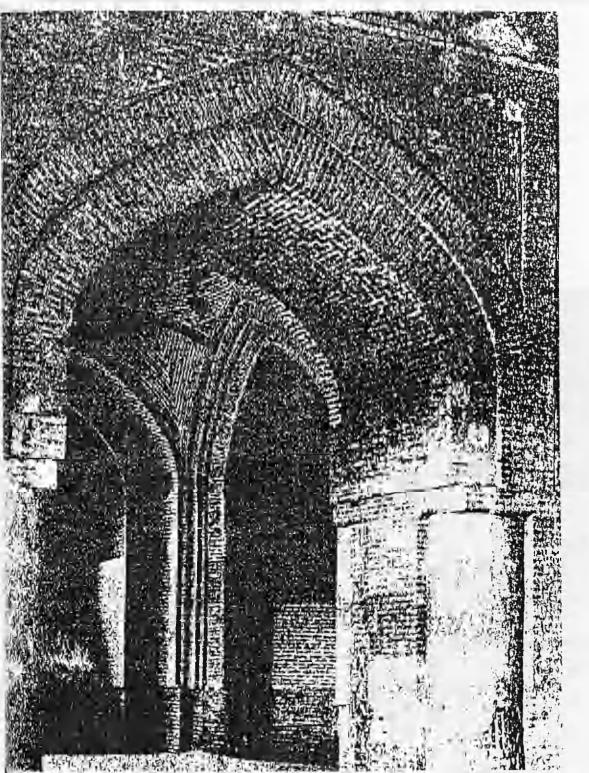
b. Creating a vault with timber frame work. c. A vault constructed by mud-brick.
